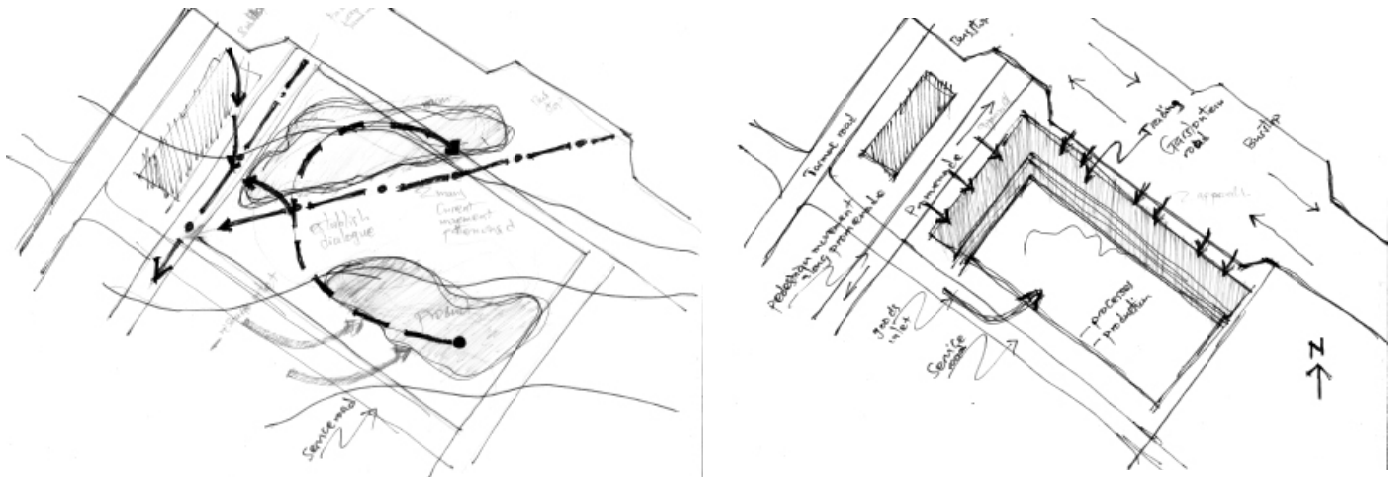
& 7.4: Conceptual plan sketches (Author, 2020)
